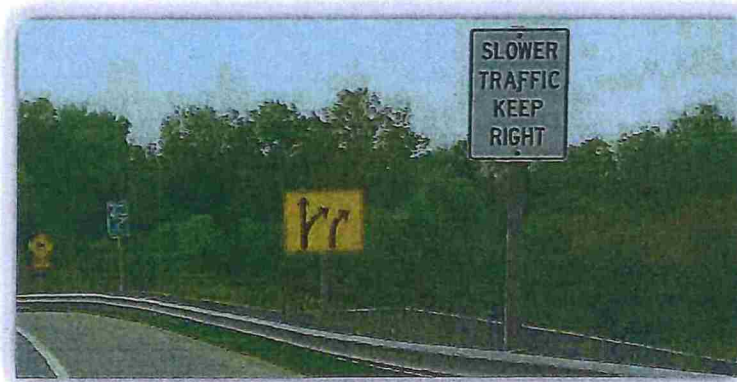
"SLOWER TRAFFIC KEEP RIGHT" Sign Upstream of the Stone Church Road and Mud Street Off-Ramp (View South from the Mainline)
